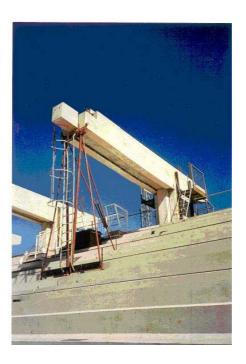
Temporary support with access ladders and work platforms for grouted post-tensioned joints
